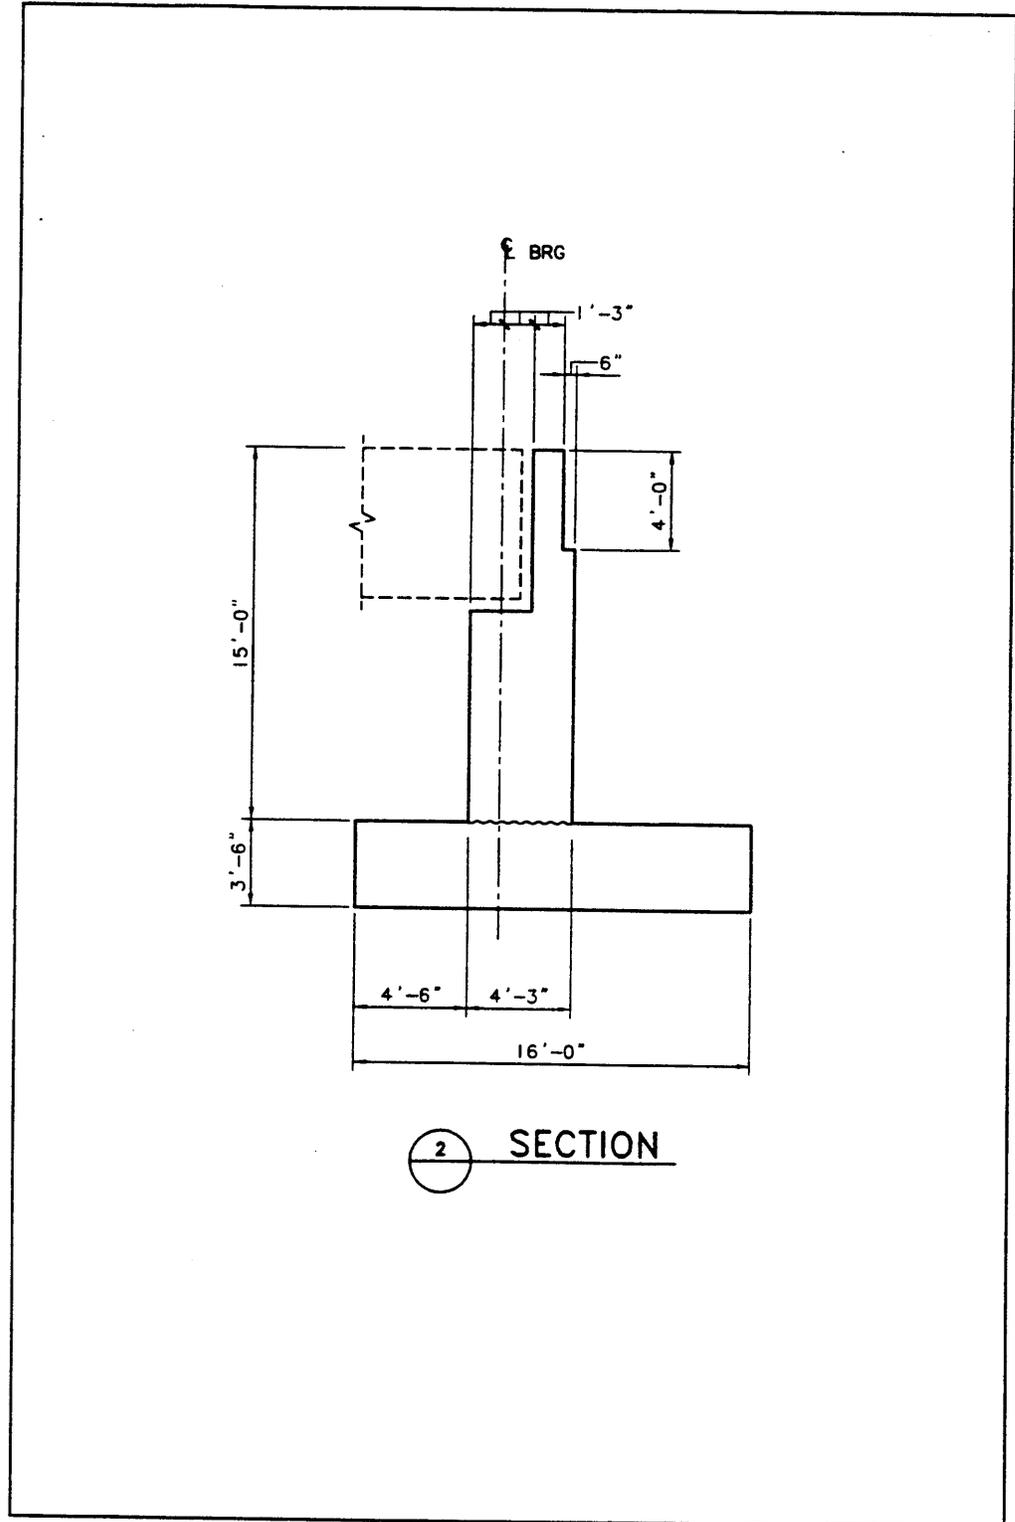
Bridge No. 2 - Seat-Type Abutment
